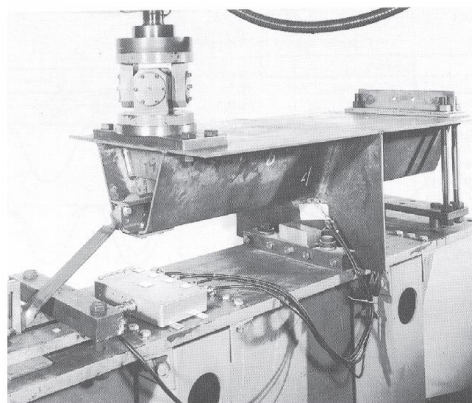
Test set-up in-plane bending crossbeam (Beales, 1990)
